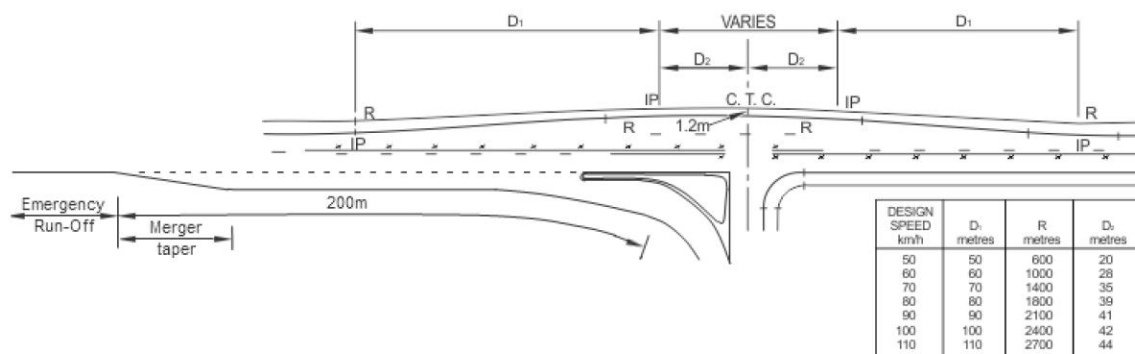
Proposed Great Southern Highway Intersection Upgrade
